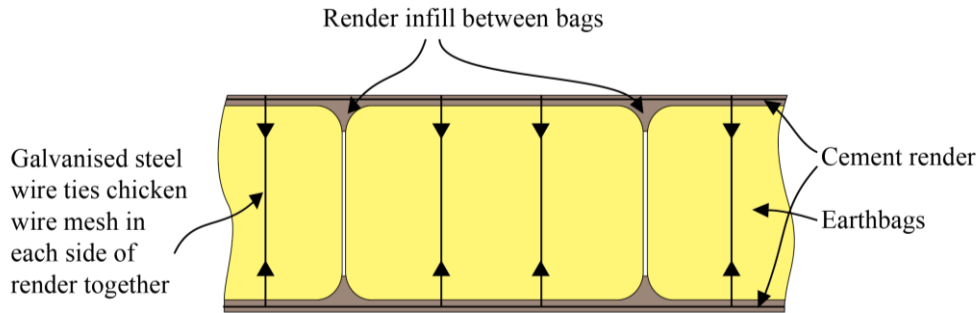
Horizontal section through rendered wall showing render infill and steel ties
